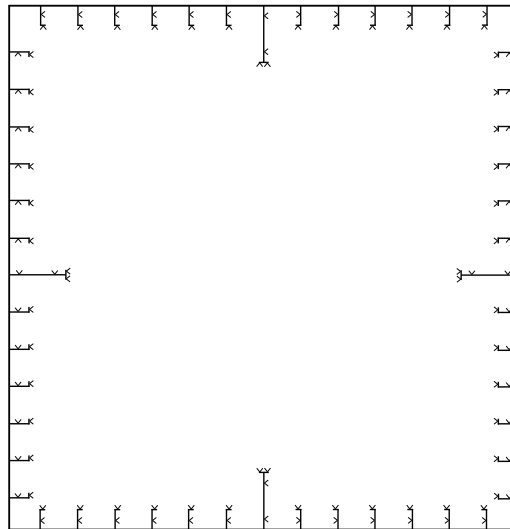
Typical location of measurement for pontoon reinforced transverse section of column-stabilized unit and TLP
